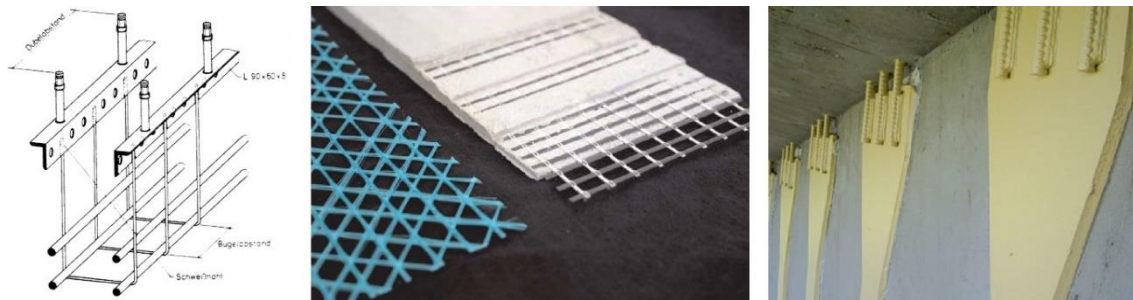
pre-fabricated reinforcement-supplement to be used on a beam (left, taken from [21]), textile concrete (left, taken from [24]) and externally attached steel plates (right, taken from [22]).
